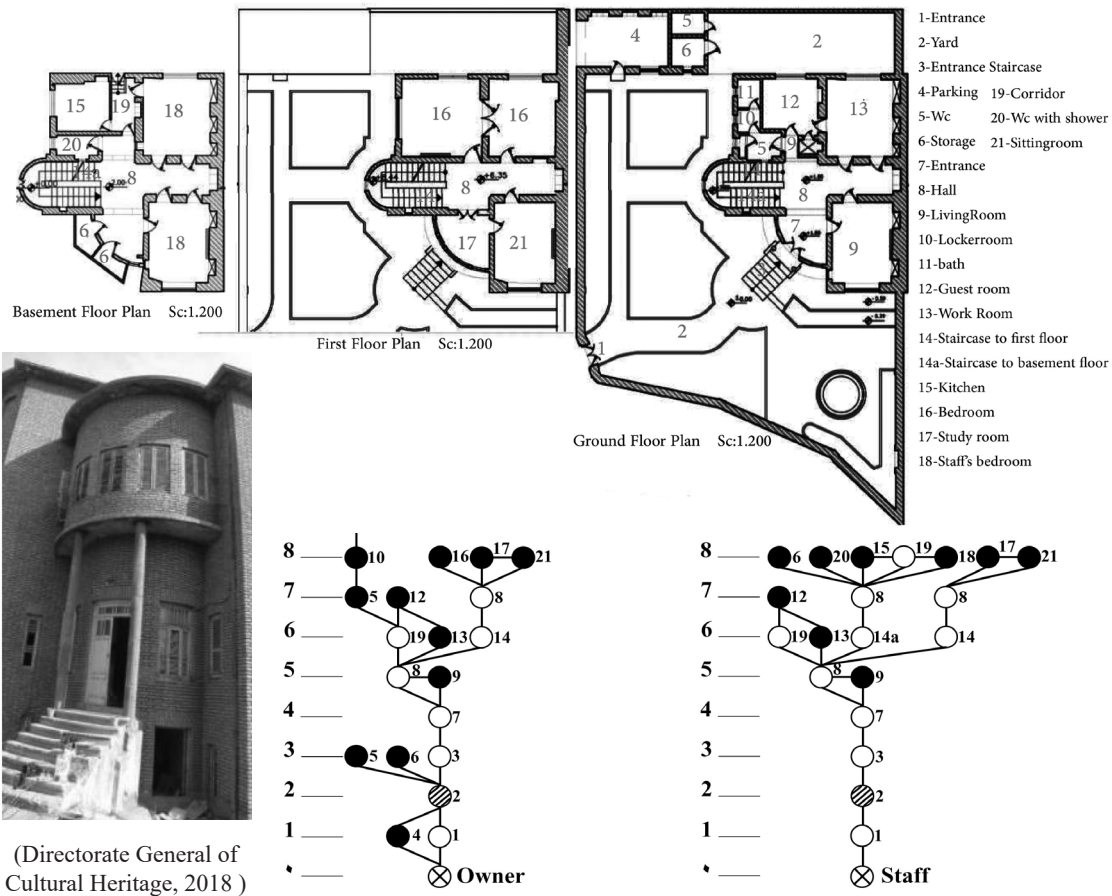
Floor Plans and Justified Graphs and Pictures of the House in Takhte Jamshid Street
